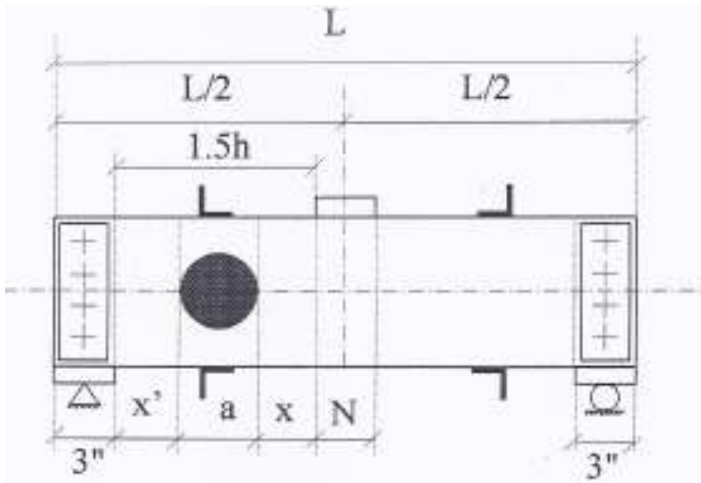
Typical cross-section of the specimens tested by Uphoff (1996)
